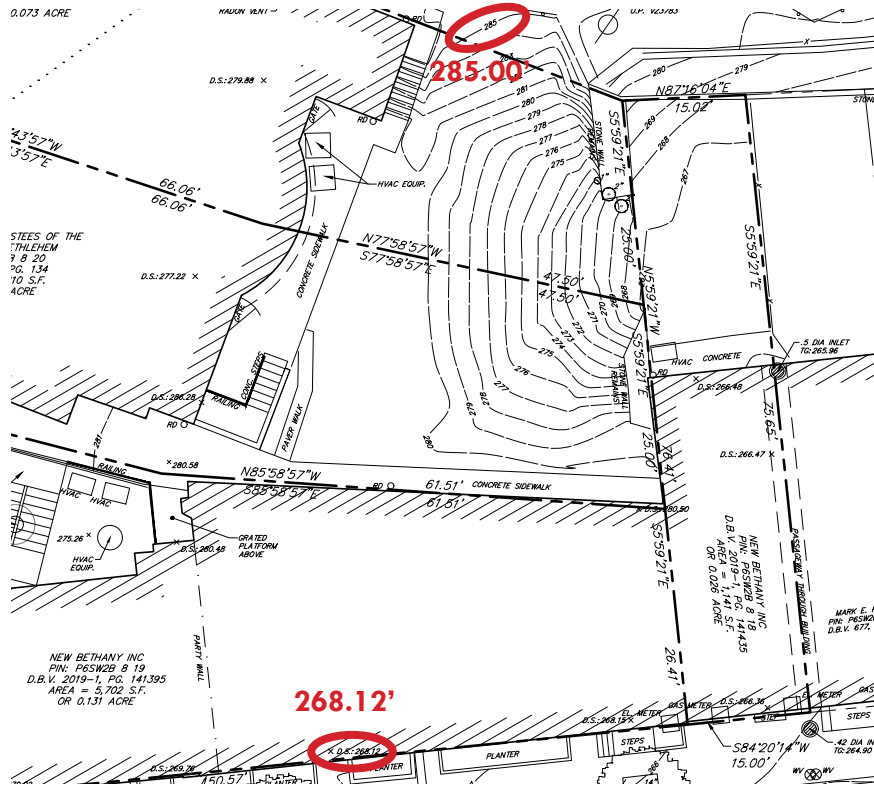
Enlarged View of Site Survey Plan, 335-339 West Fourth Street; Survey by Barry Isett Associates, Inc. [For full-size plan, refer to separate drawing package] Grades indicated in Red Circles. Low end at bottom of plan (West Fourth Street) and high end located at top of plan (Parking Lot accessed via Wyandotte Street).
